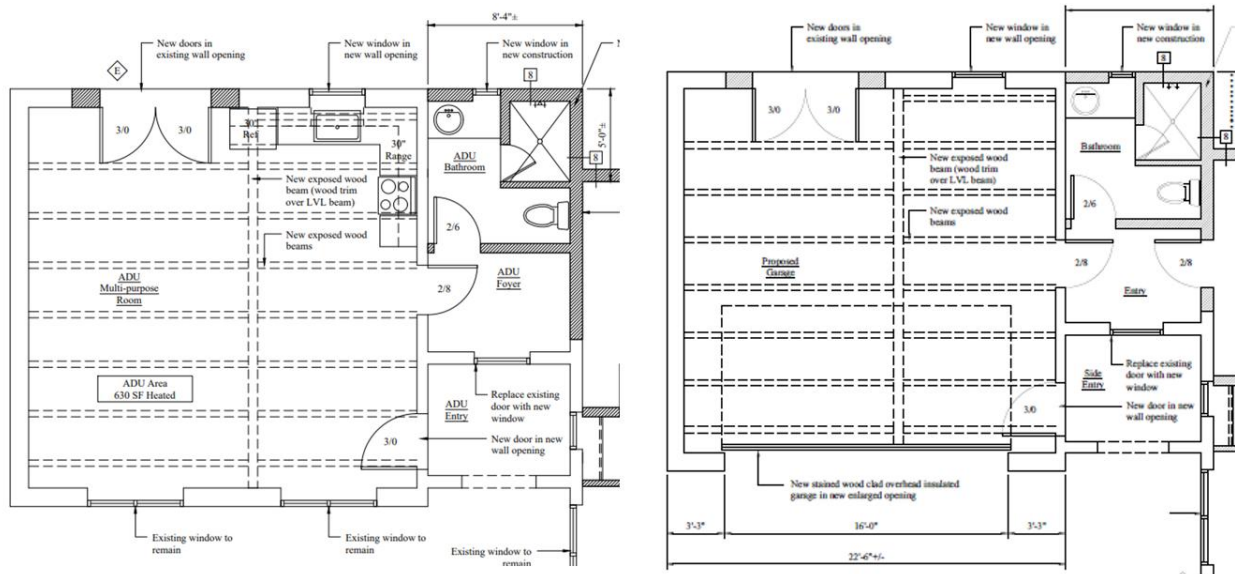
Previously Approved Floor Plan and the Proposed Floor Plan
